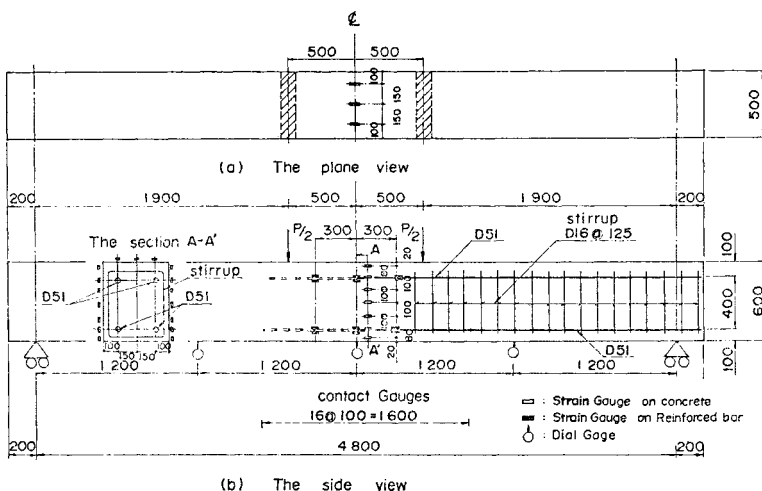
Dimension and Gauge Position of RC Beam with D 51
